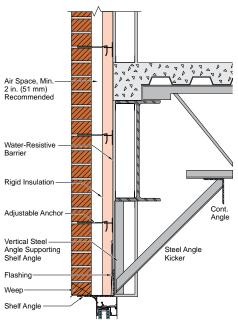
Brick Veneer / Cold-Formed Steel Framing Bracing System
